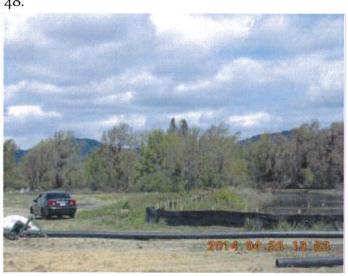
Looking northeast at Rutledge Pond. No sediment control at the boundary of Rutledge Pond Construction storm water has flowed uncontrolled into the pond all rainy season. Perimeter control must be installed.
